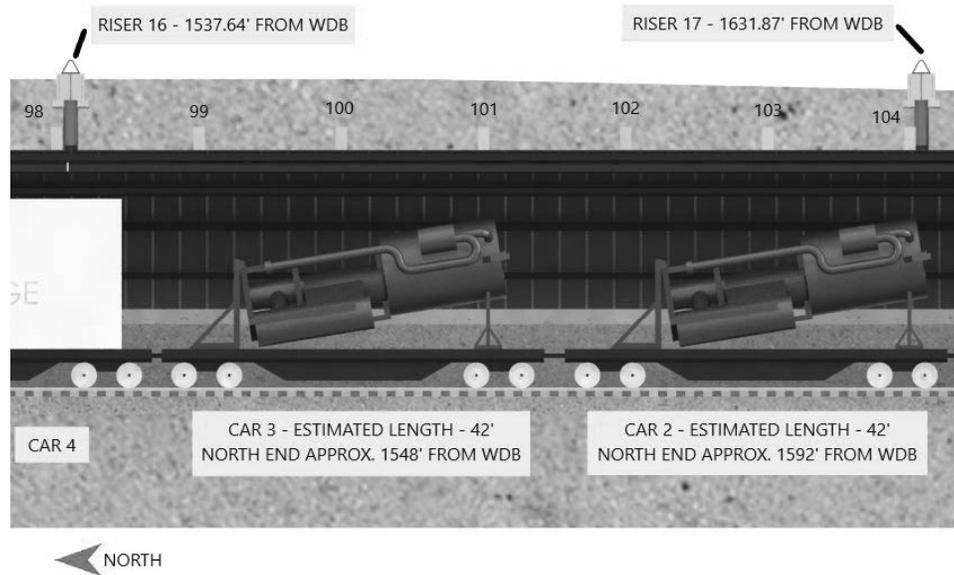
Riser 16 to Riser 17 Tunnel Section.
